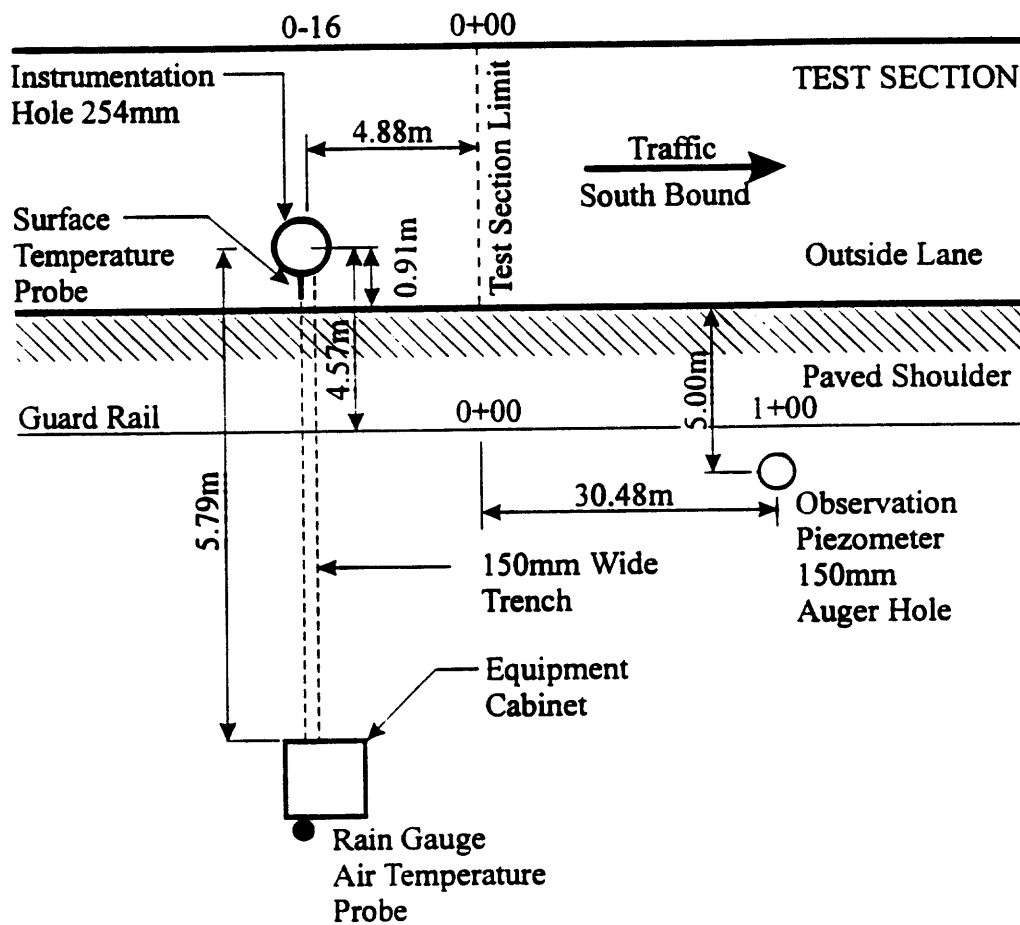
shows the locations of the installed instrumentation at the site. The instrumentation hole is at station 0+16 and the piezometer is at station 1+00. Table 2 gives elevations of the portion of Section 510113 that was used for elevation measurements. All offsets are from the PK nails found at the outside pavement edge.
